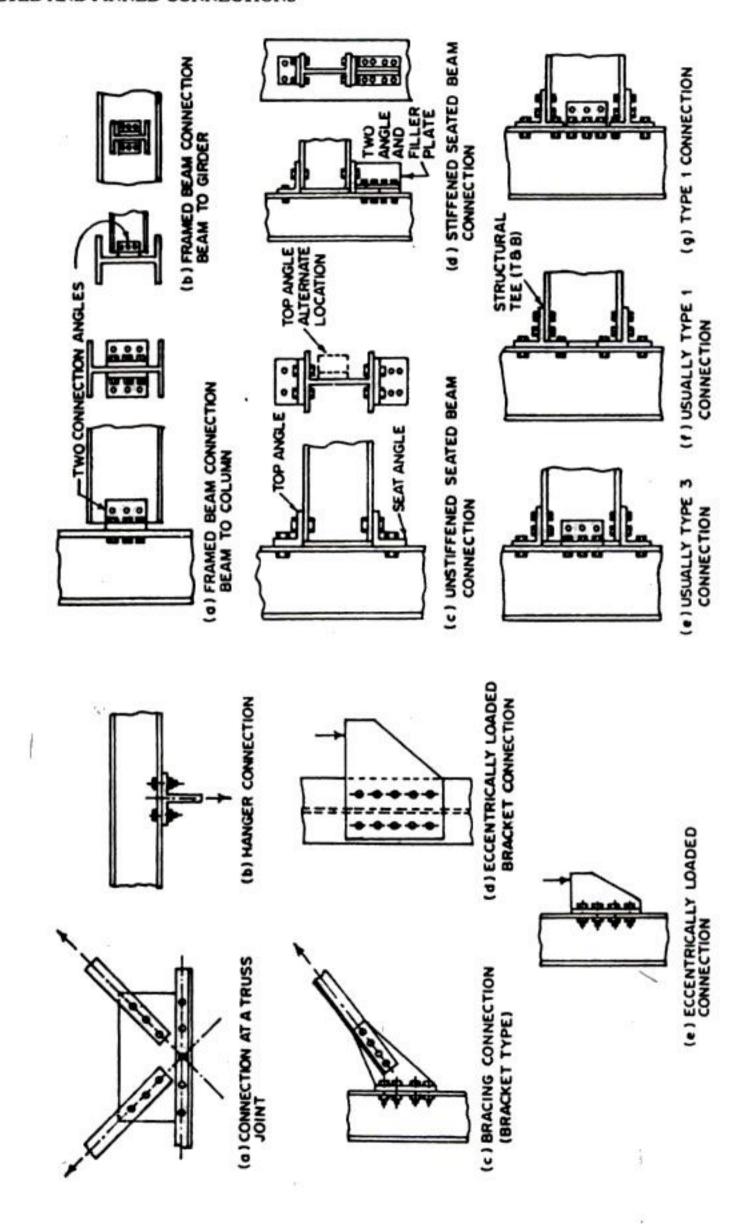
COMMON TYPES OF BOLTED BUILDING CONNECTIONS. FIG. 4.6. COMMON TYPES OF BOLTED CONNECTIONS.
